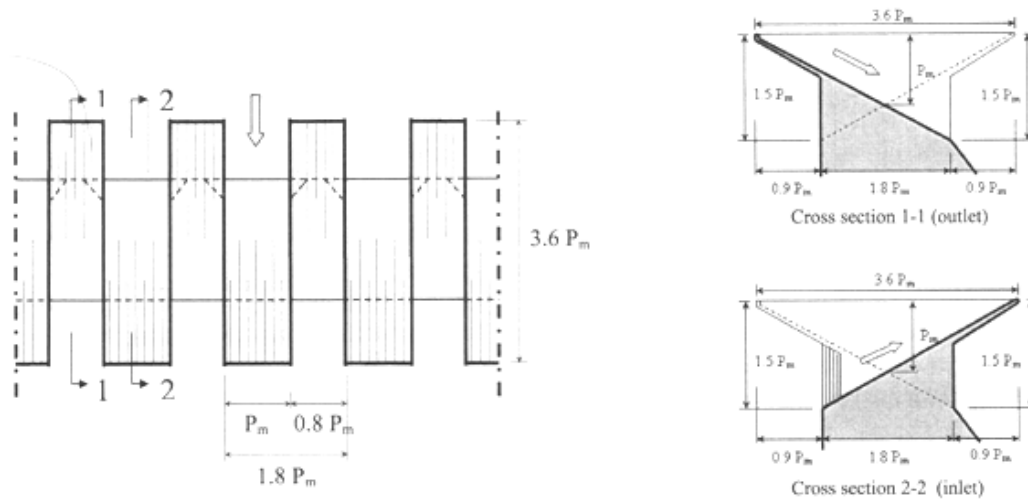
Proposed reference design pour PKW model A – plan view (left) and cross sections (right).
